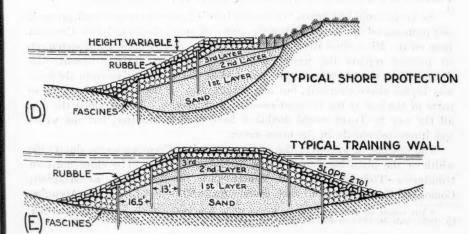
BANK PROTECTION AND TRAINING WALL FOR RIVER PO.
